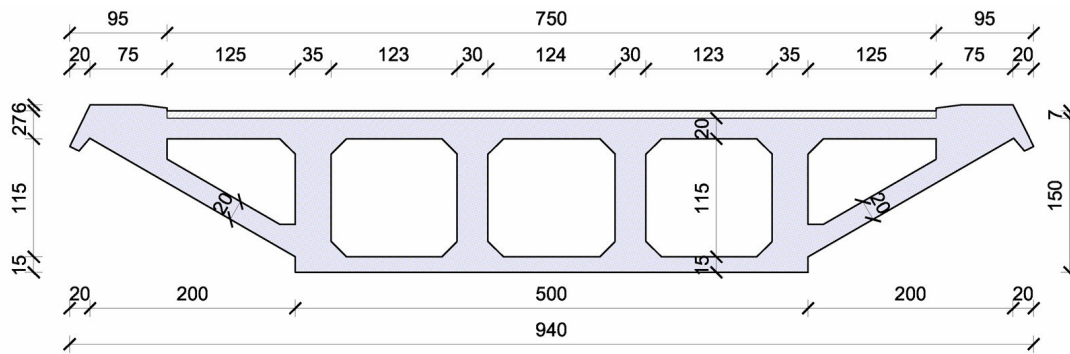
"Carrodano" viaduct: typical cross-section (dimensions in cm)
